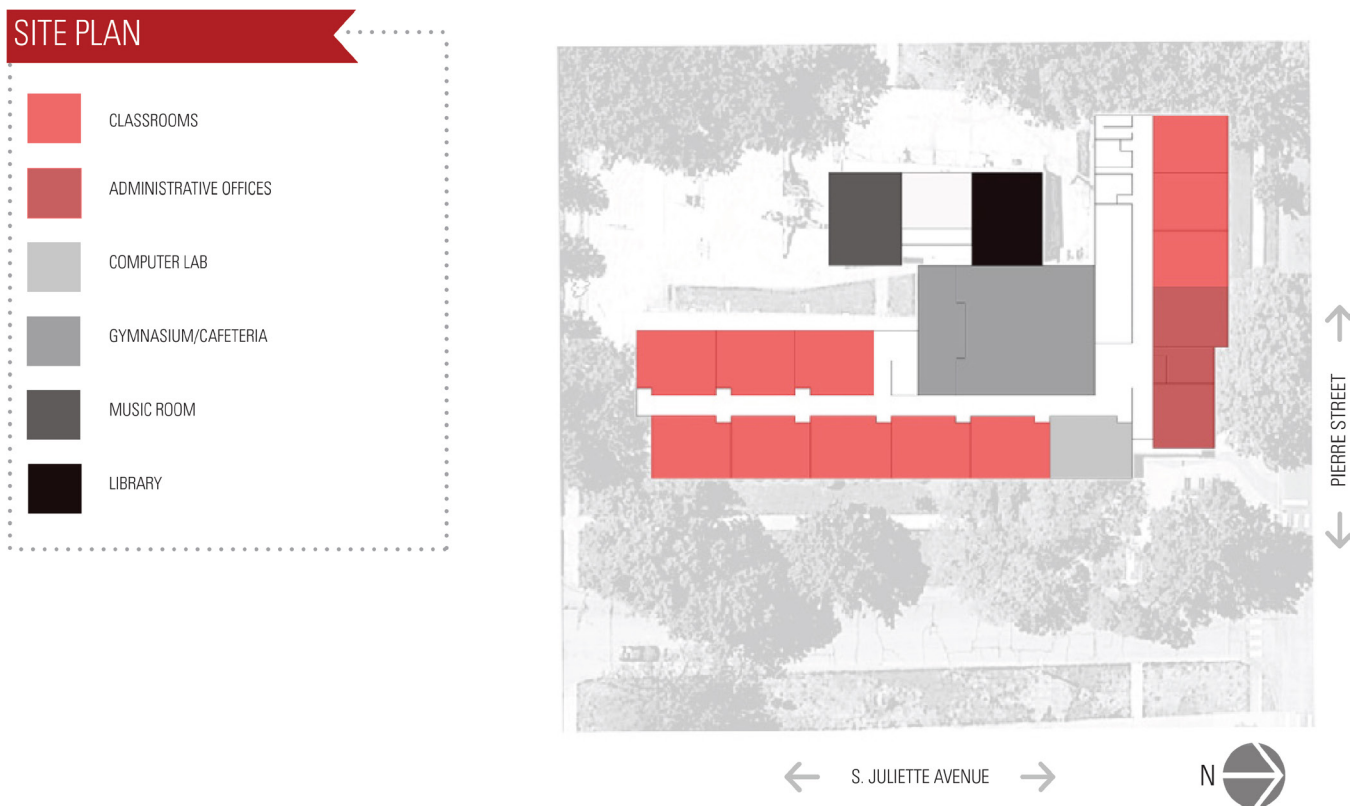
Floor plan of existing grade school showing zones for team assignments.
